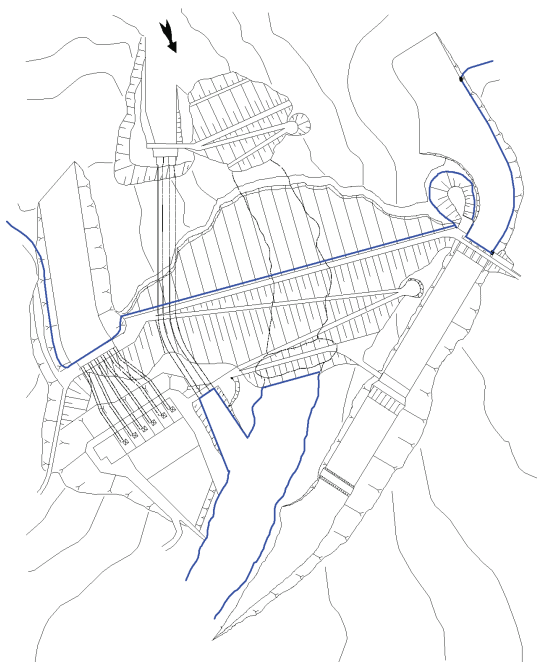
Typical layout for a medium-wide river valley (Gov. Bento Munhoz da Rocha Neto hydropower plant – Foz do Areia, Iguaçu River, South of Brazil).
